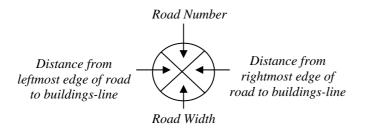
A special symbol used in Urban Construction Plans to define the ROW.
